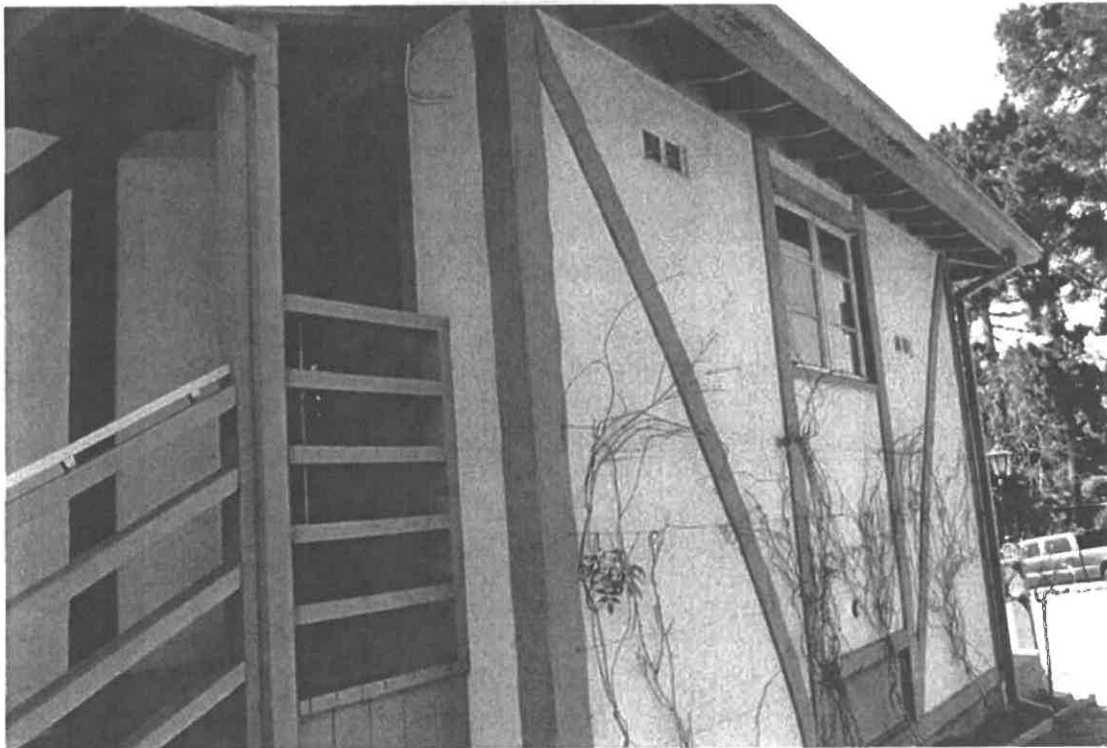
, Looking SW at the stair, steps & door proposed for in fill, as part of interior room remodel, Kent Seavey, Sept., 2017.
